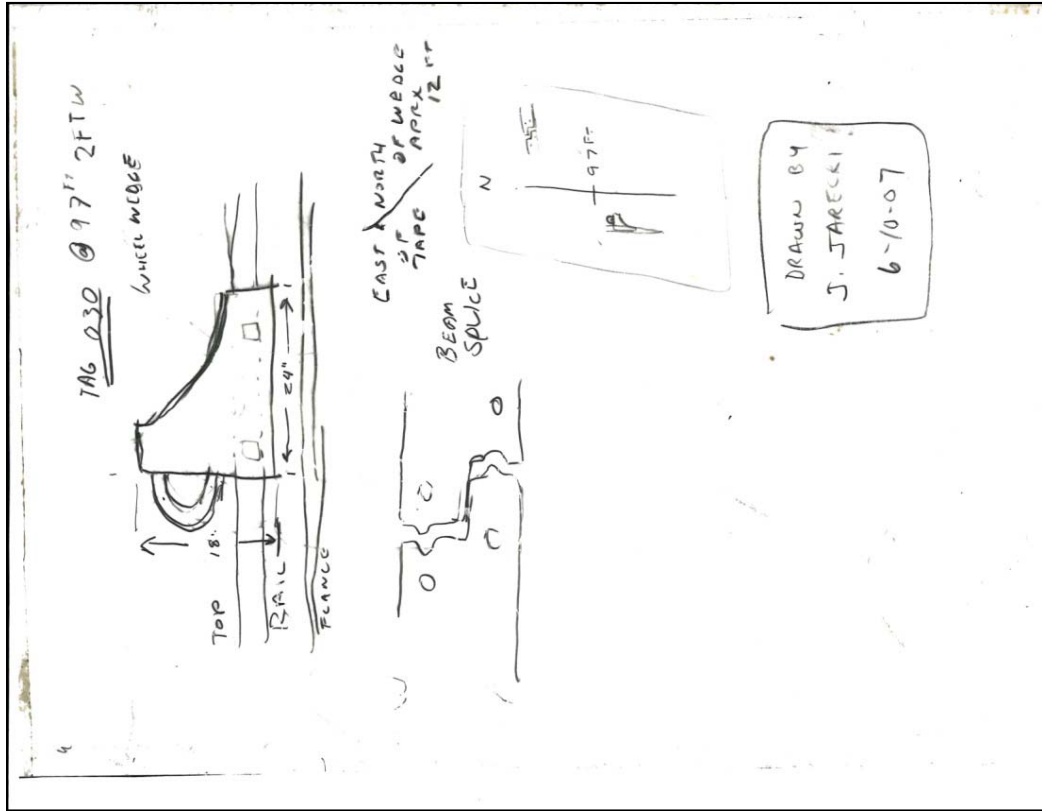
Detail Sketch of Wheel Chock and Scarf Joint
